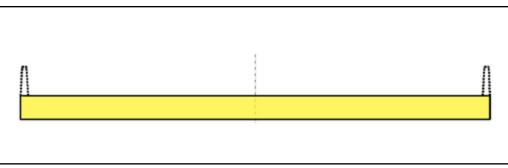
Reinforced Concrete Slab (Highlighted)
